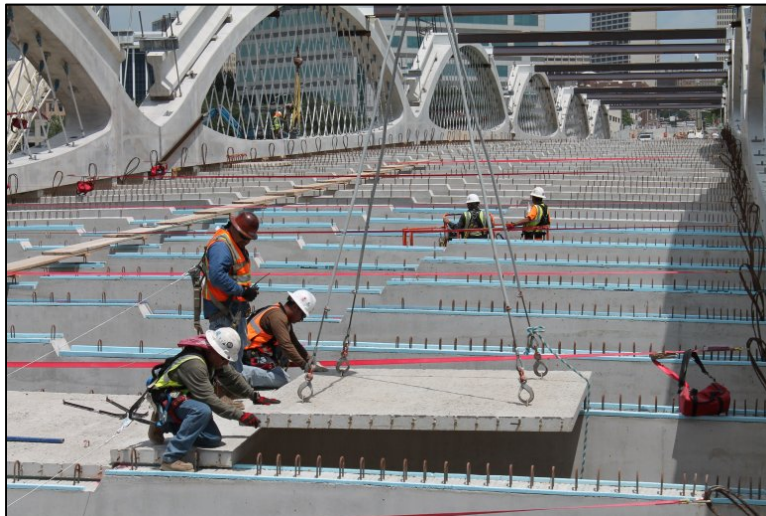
Installation of the precast panels. (Photo courtesy of TxDOT)
